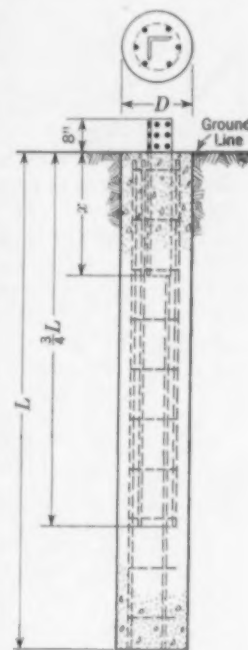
TYPICAL CAST-IN-PLACE PILE WITH REINFORCING AND CONNECTION STUB-ANGLE
